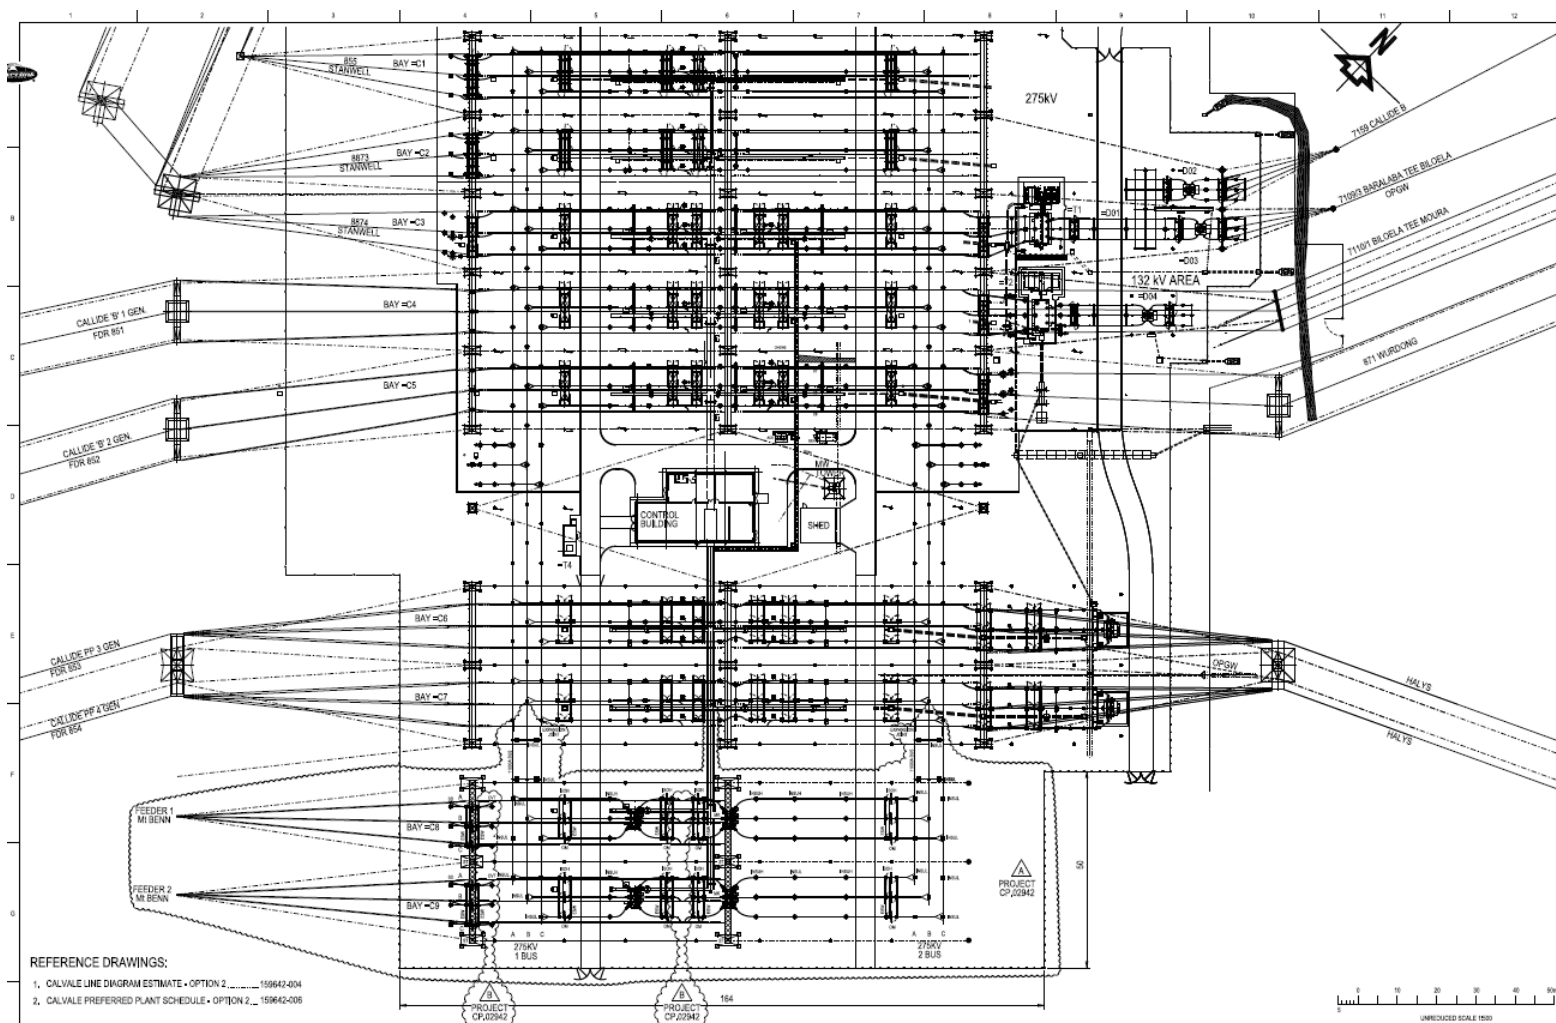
A Substation general arrangement (Calvale Substation expansion)
